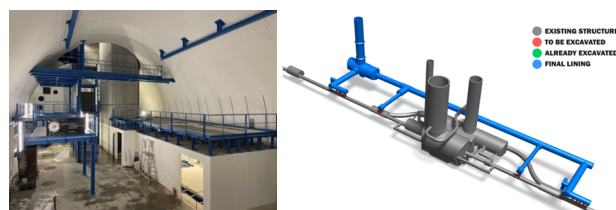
The new underground installation. Left: View onto the metallic structure of the cavern. Right: schematic view of the new underground structures.
